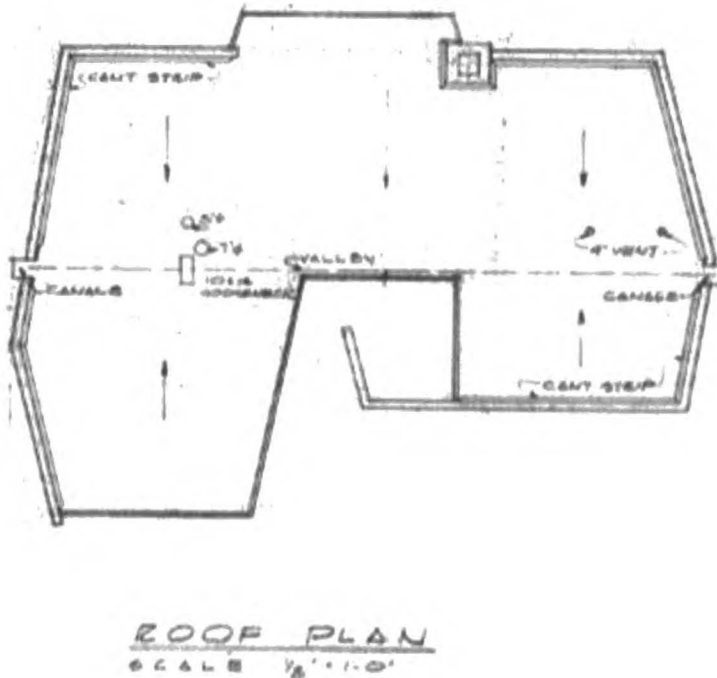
Roof plan for 109 Camino Santiago, 1963.
